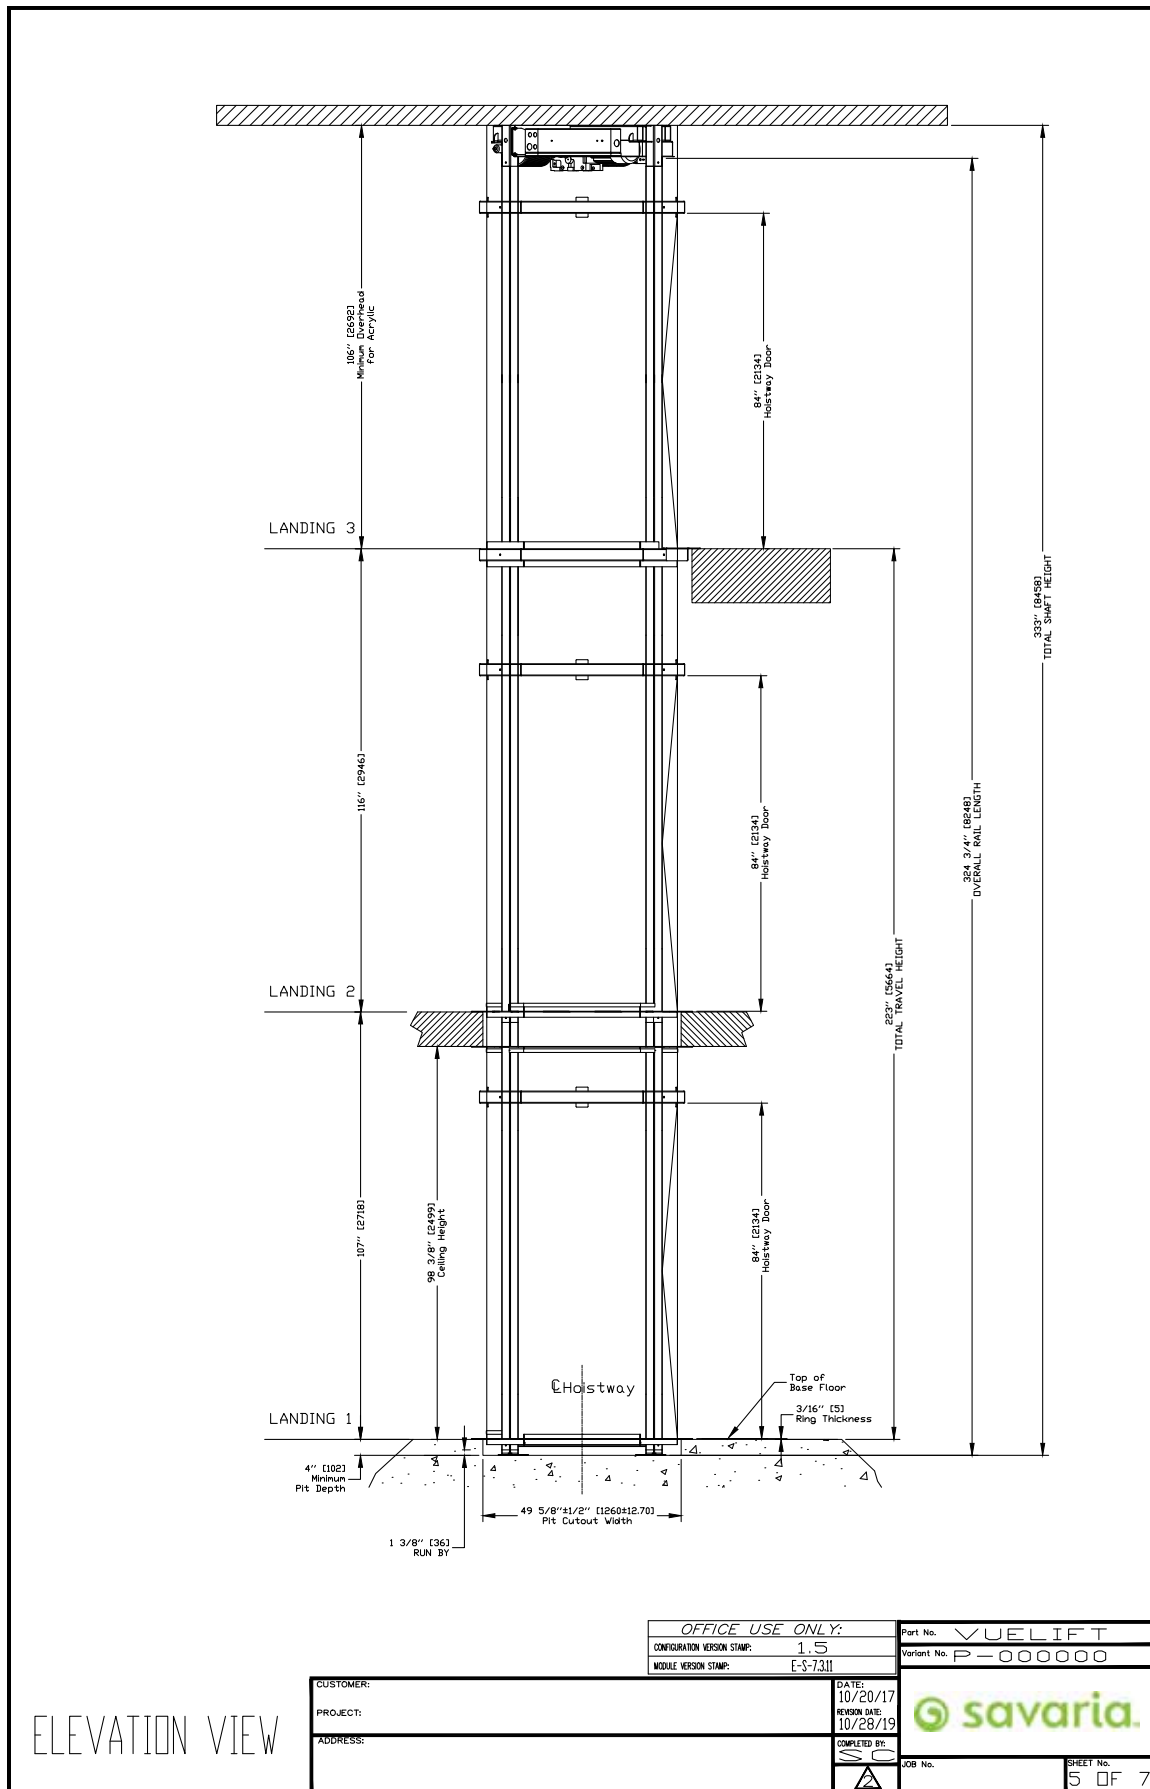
Elevation view (OAM, type 1) - extra header rings if floor-to-floor height &gt; 14 ft
